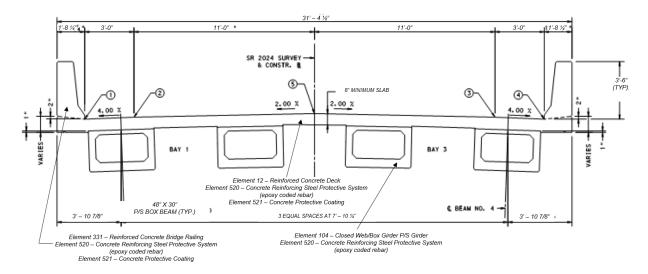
Typical Section of P/S Non-Composite Adjacent Box Beam Bridge (looking ahead)
